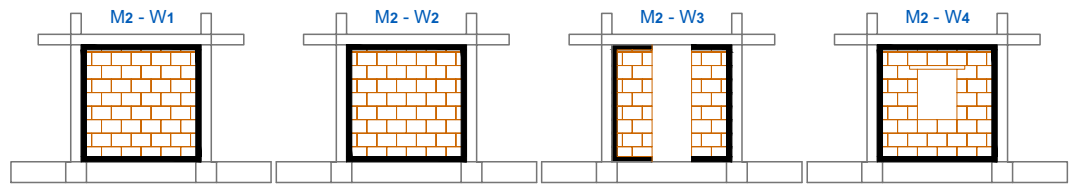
Model 2. Infill walls and rubber joints placement. M = Model, W = Wall.
